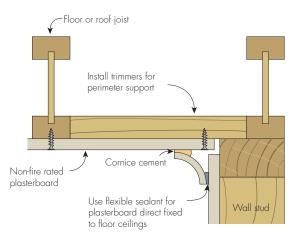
Trimmer Support For Ceiling to Wall Direct fixed to joist
